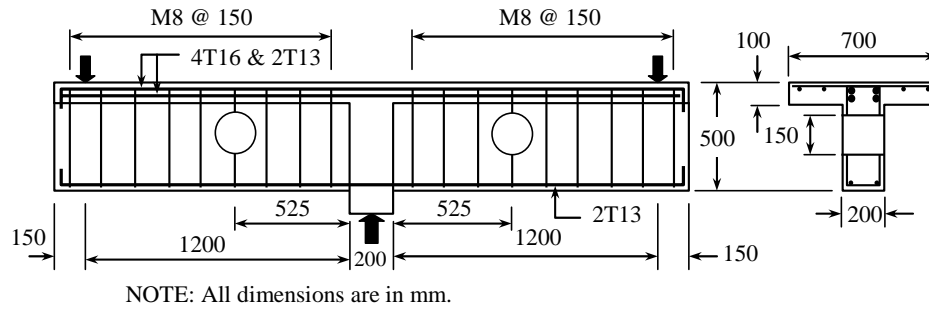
Reinforcement details of beams tested by Mansur et al. (1999).
